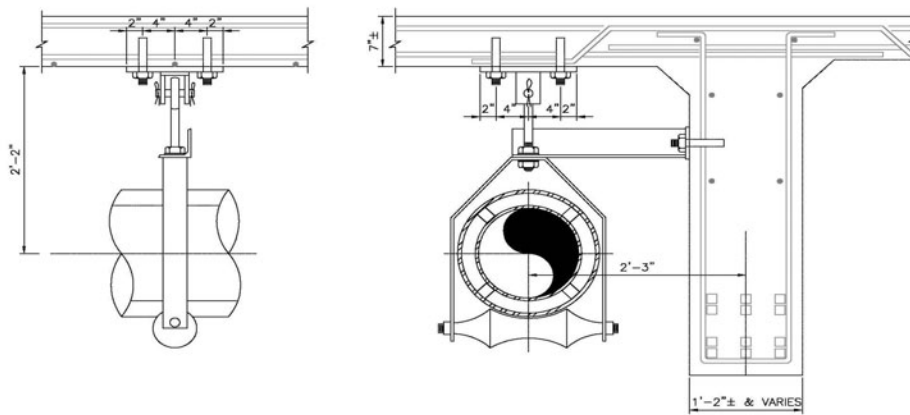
Detail for 710 Freeway Bridge Pipe Hanger
